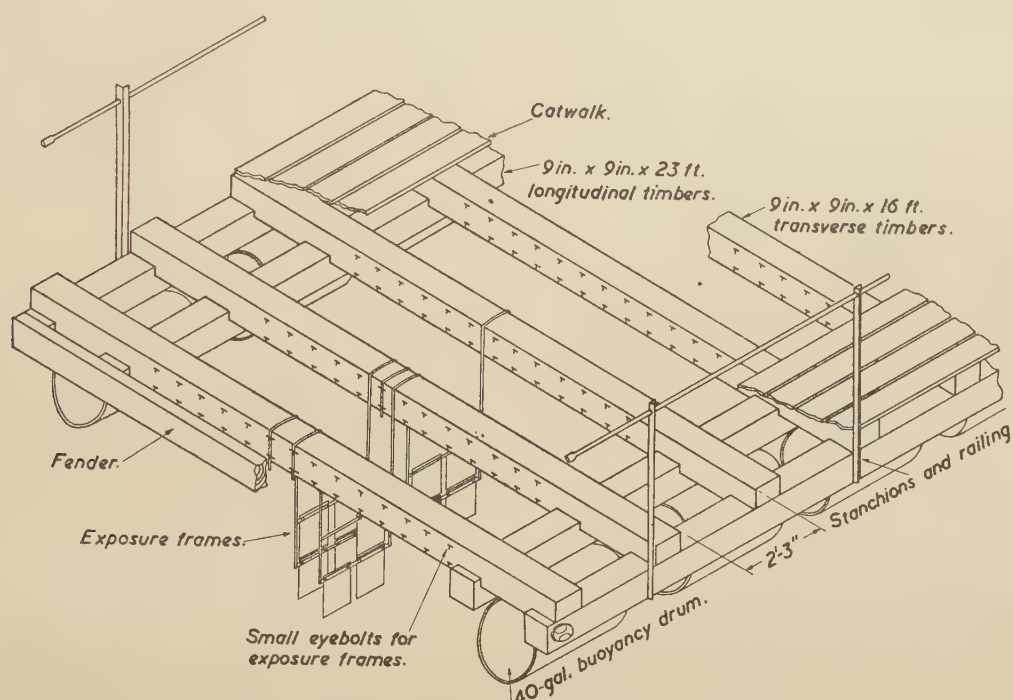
Dissected Isometric View of Half the Large Millport Exposure Raft.
